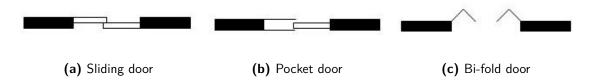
Basic models of sliding door, pocket door and bi-fold door
